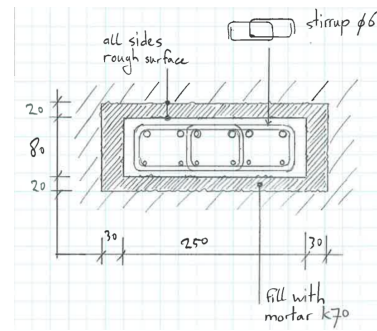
Cross section of the console connected to the wall. Dimensions in *mm*. (source: [27, p.121])
